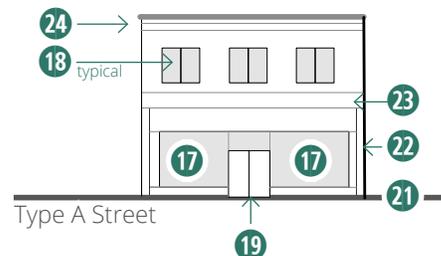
(7). Storefront Building Elevation: Facade Design Requirements
